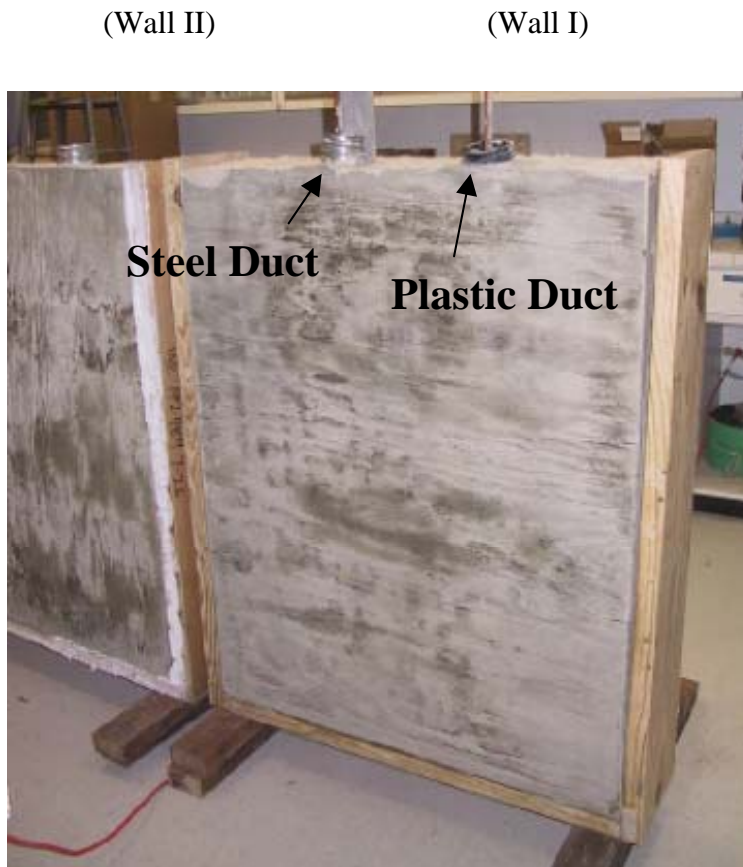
Concrete Walls with Steel and Plastic Ducts
